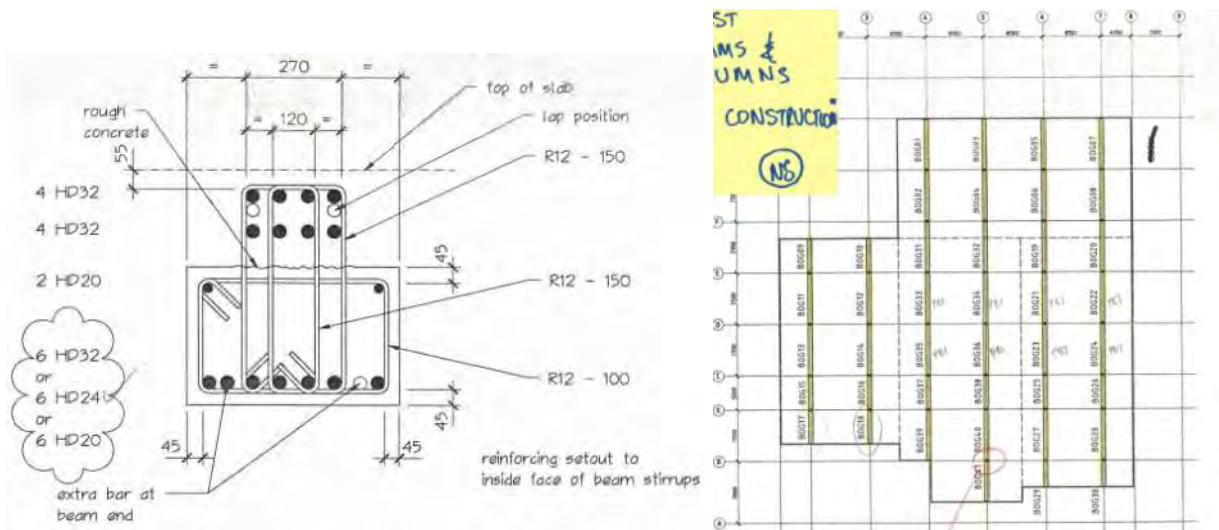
Extract from as-built drawing - plan of precast concrete frame with foundation; extent of beam of frame
